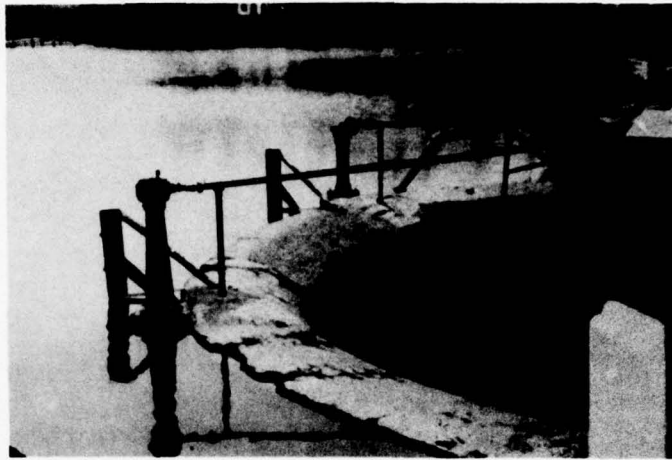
View of semi-circular concrete spillway weir abutting the reinforced concrete spillway bridge structure over Matawan Creek; the low level outlets are operated by crank extensions from the side walk (see Photo 5)
